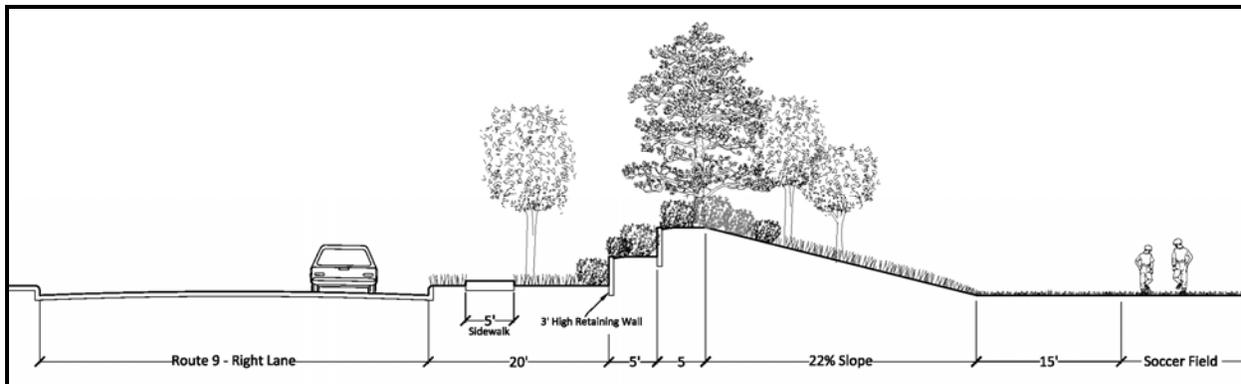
Cross section showing landscaped retaining wall and berm at soccer field.
